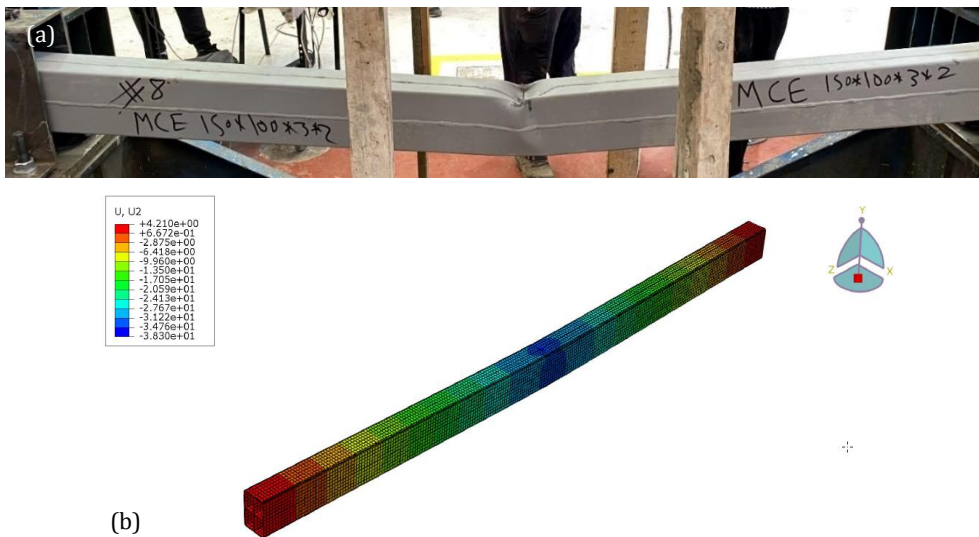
Deformed shape of 100X150X3X2 empty multi-cell column (MCC-E):
